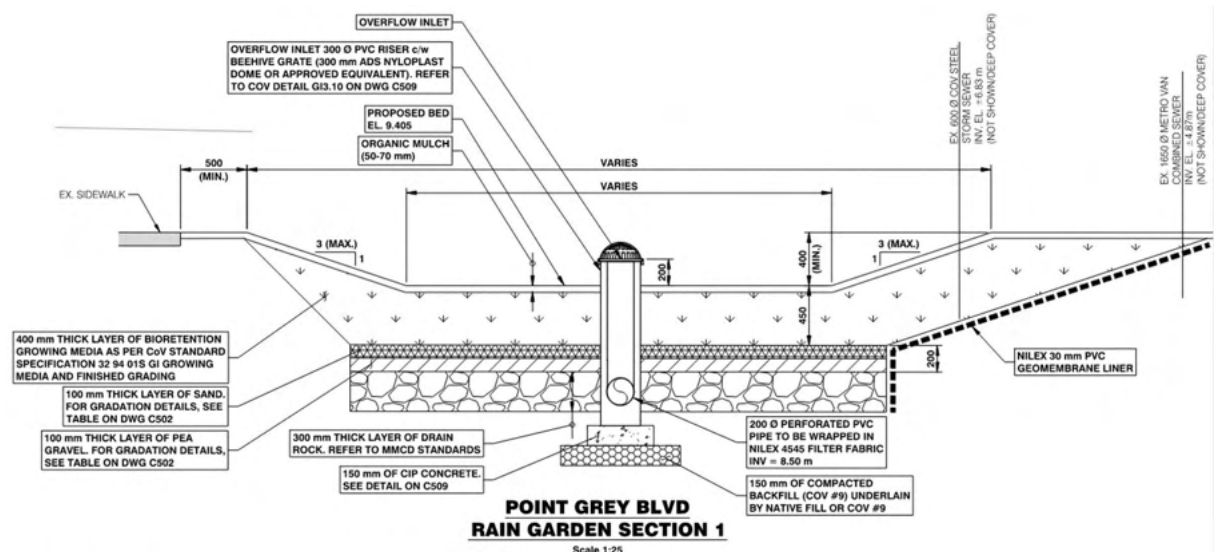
F: Example of Engineering Cross Section Detail (Tatlow Park – KWL Associates Ltd.)
